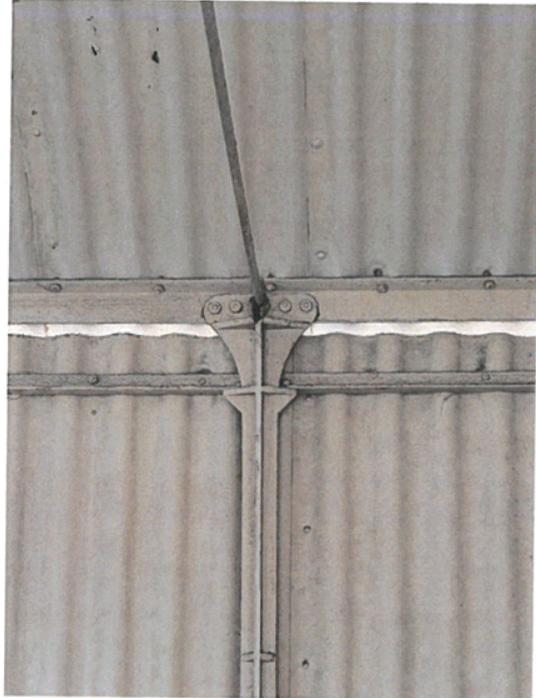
Detail of cast iron, cruciform wall stanchion, top plate and horizontal tie rod.
